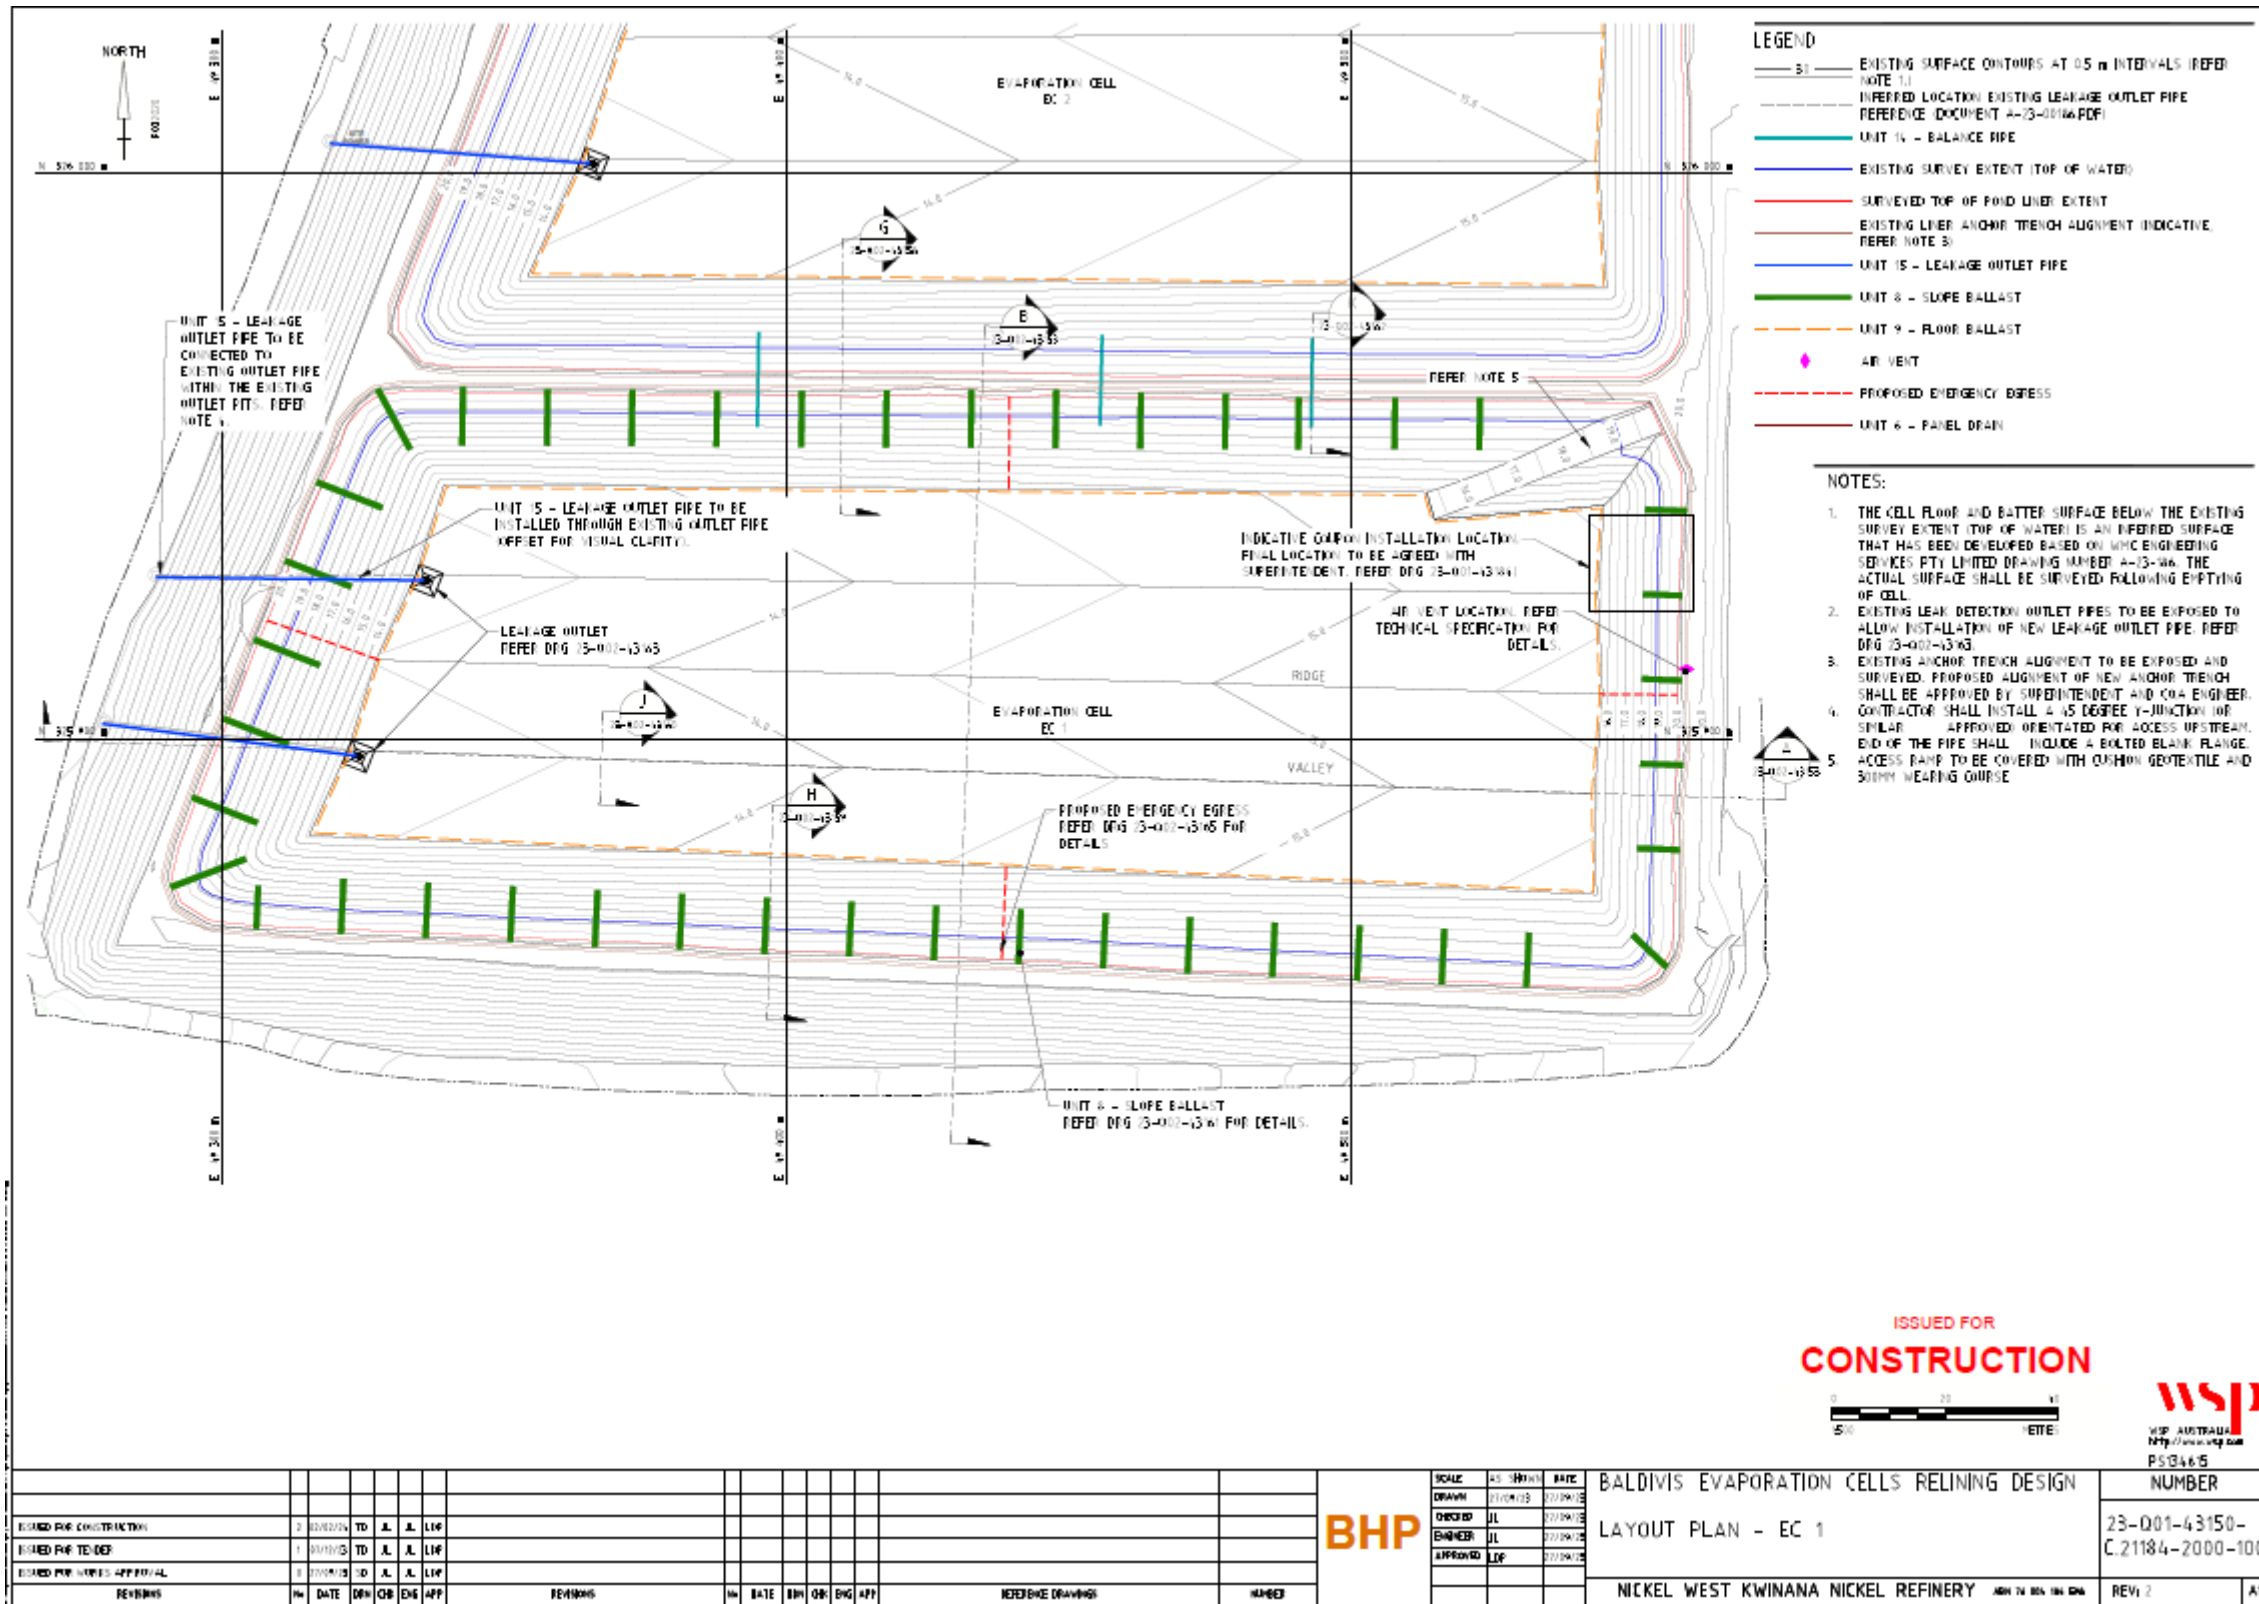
Layout plan for evaporation cell 1 showing access ramp and floor gradient valleys towards leakage outlet pipes
